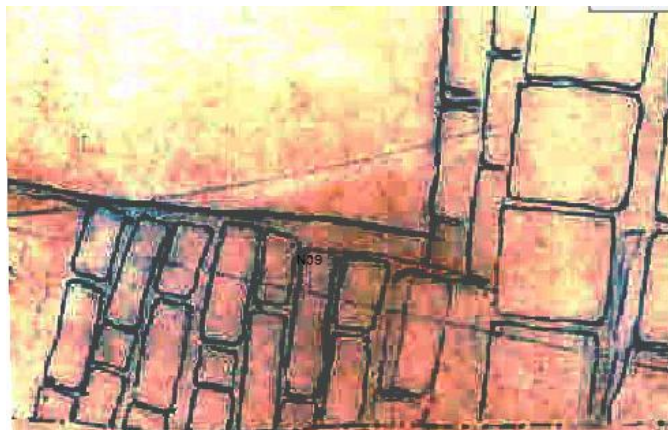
Vault above doorway of space NE-7. A running bond using, whole, 1/3-size and 2/3-size bricks.
